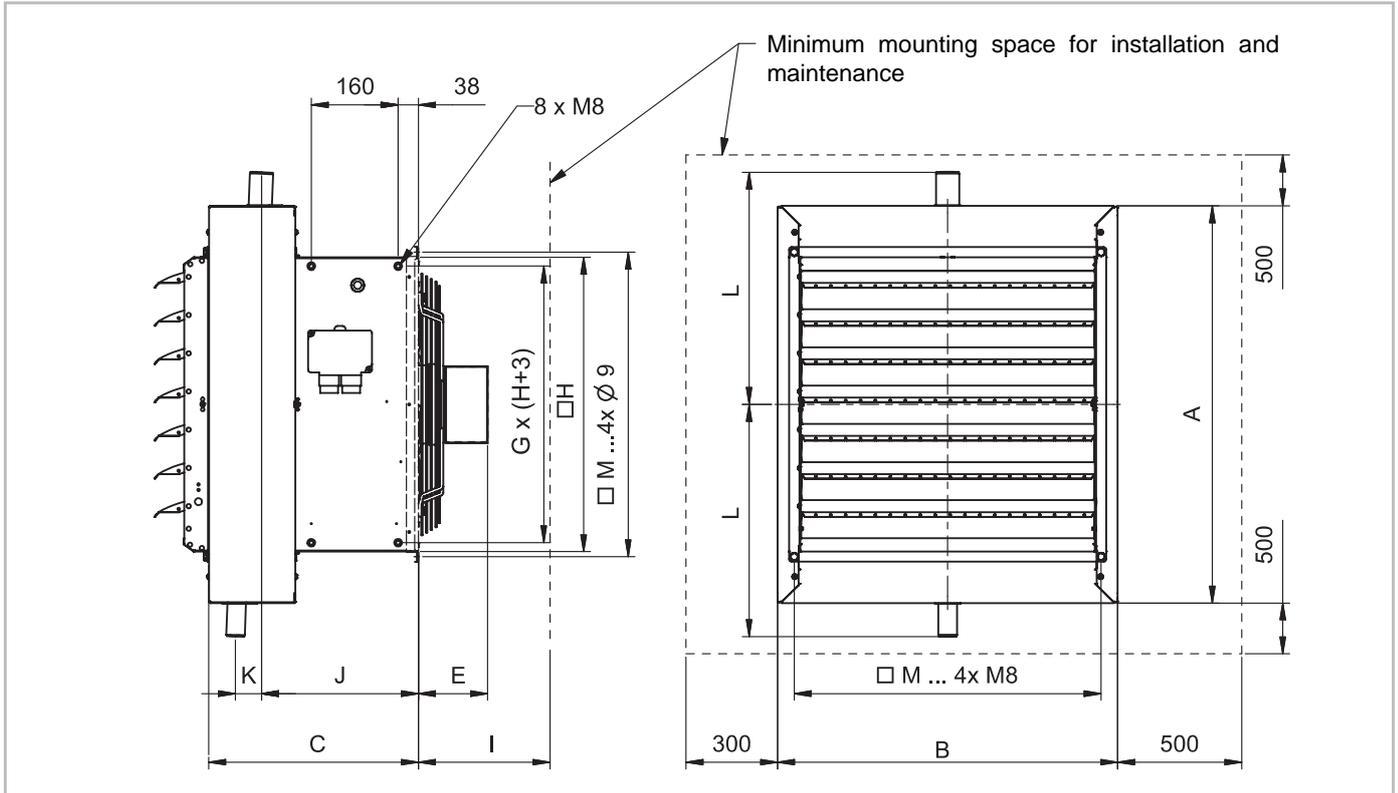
Dimension of unit heater and arrangement of heat exchanger connection fittings - only steam heating
